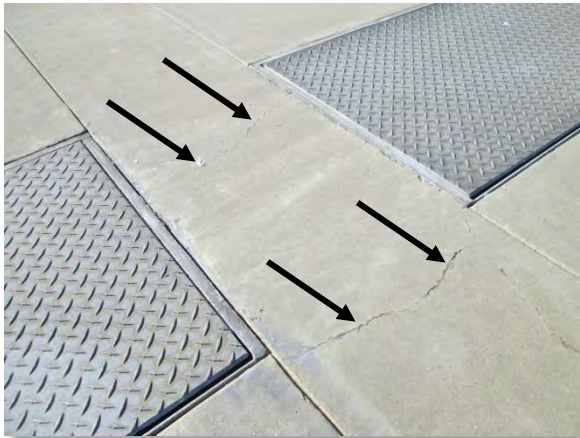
Cracking of platform above west end of SST 2 (typical).
